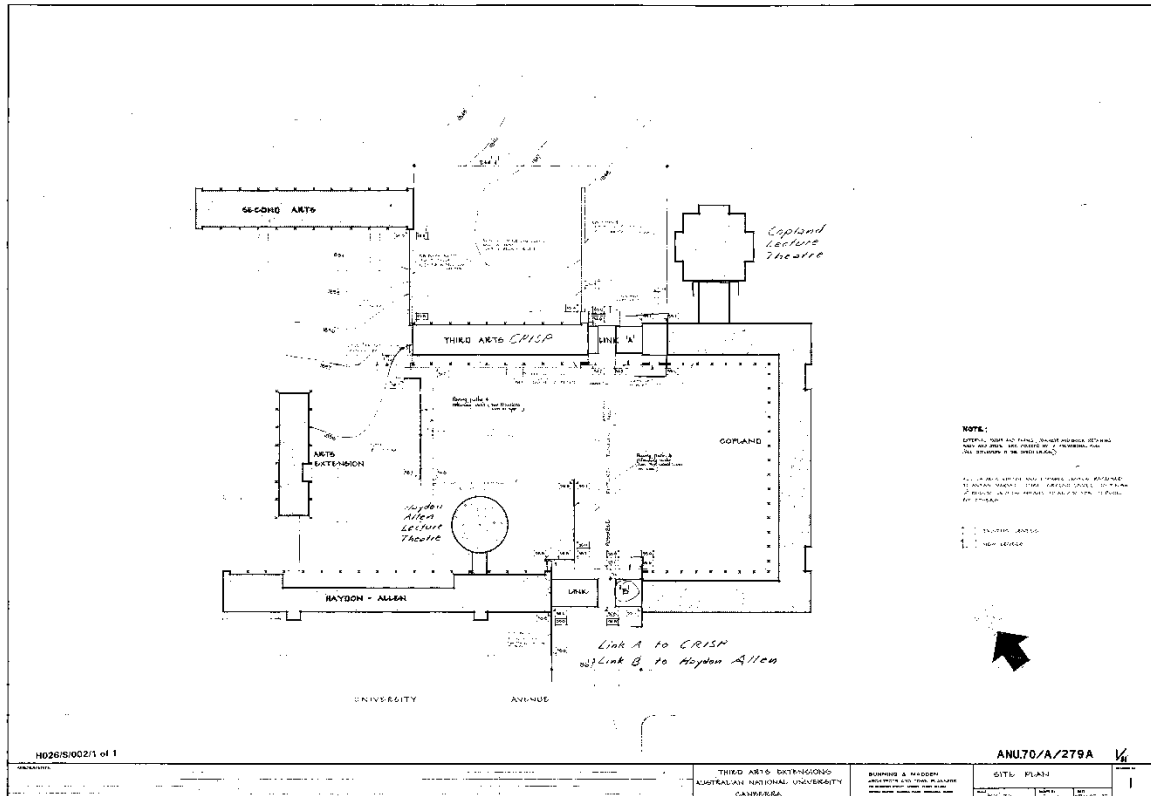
Site plan for the LF Crisp Building, drawn up by Bunning & Madden Architects & Town Planners, September 18 1970.
